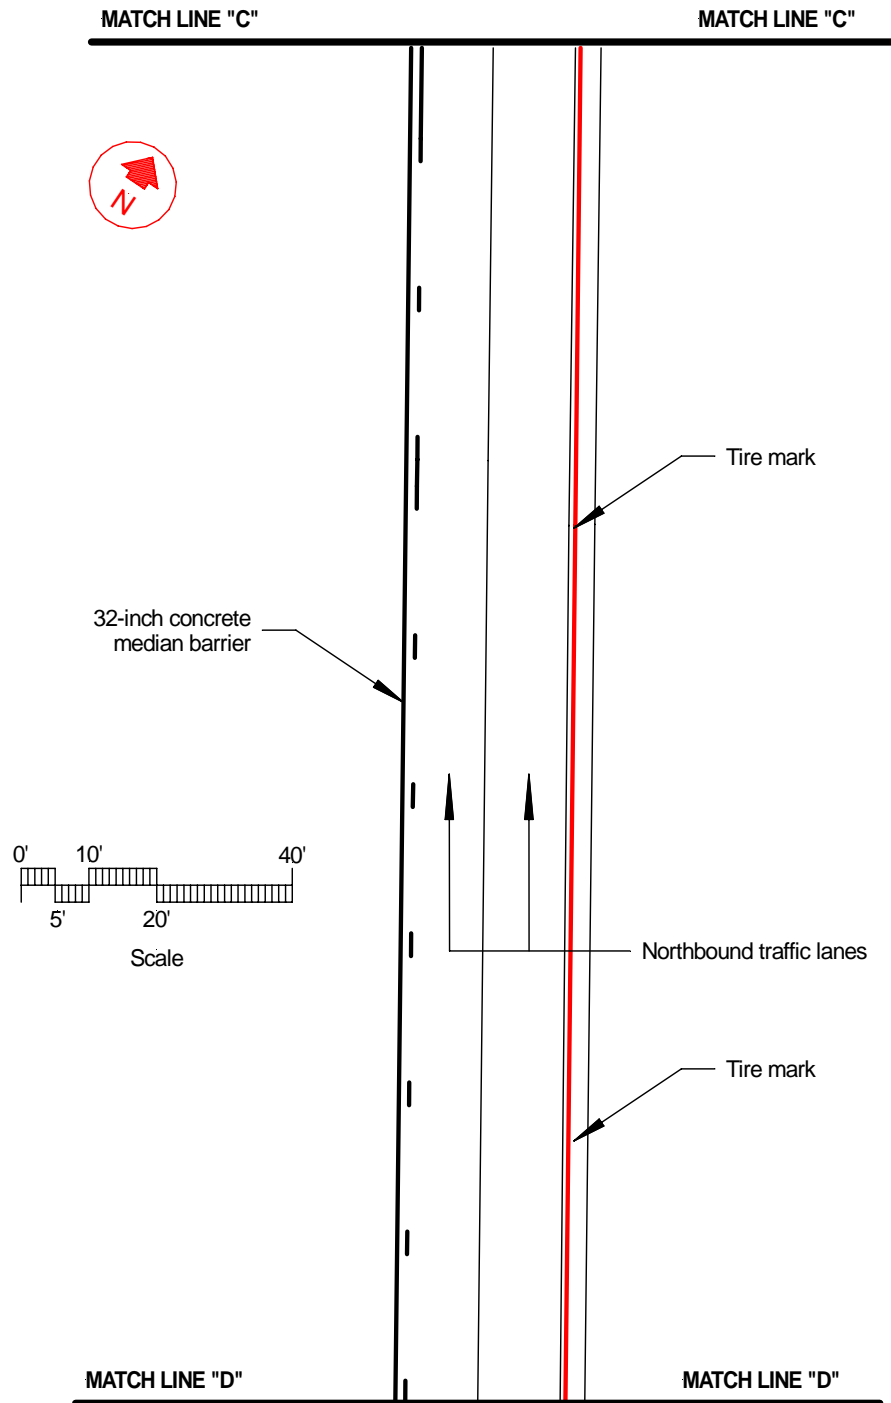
NTSB map of C-D pavement markings and roadway evidence.
